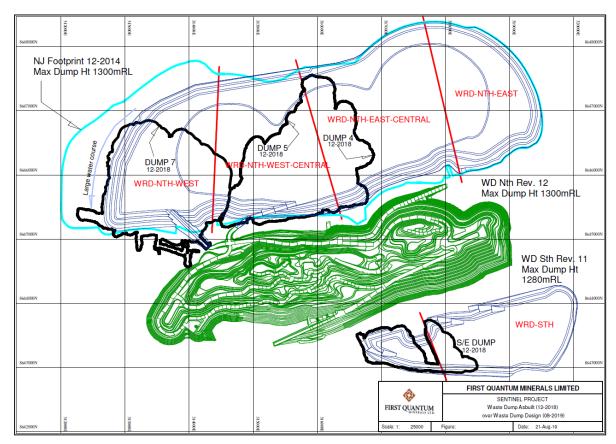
Sentinel Pit, waste dump design, 2020 Mineral Reserve plan
